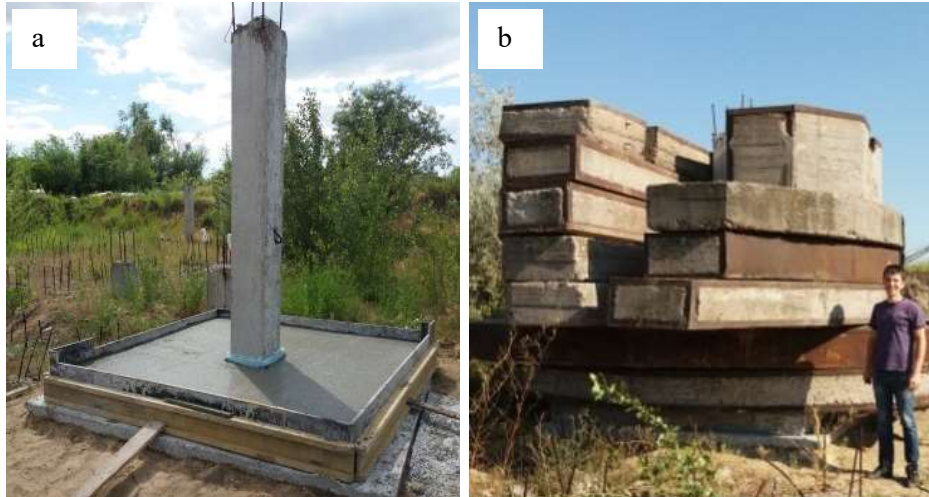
Pile foundation fragment a) reinforced plate with an opening and the pile;
